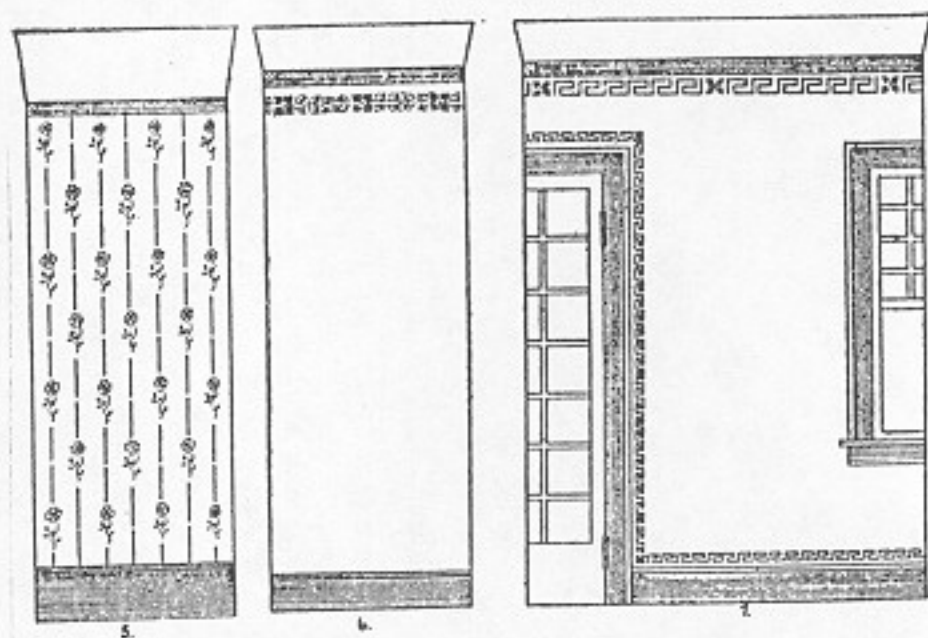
Stencil Treatment for Small Rooms with Low Ceilings.
